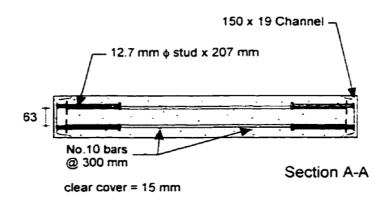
RC wall specimen with boundary elements of steel channel section (Tupper, 1999).
